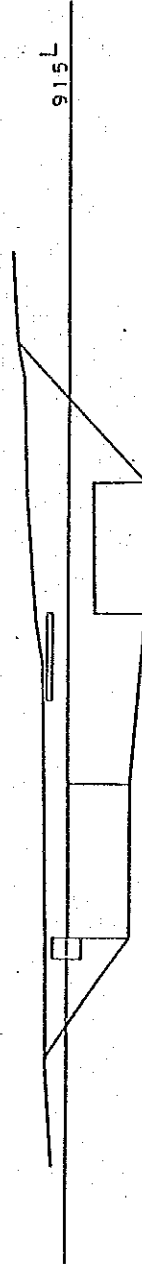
Final Pit Design for No 4 Shallow Orebody (2)
